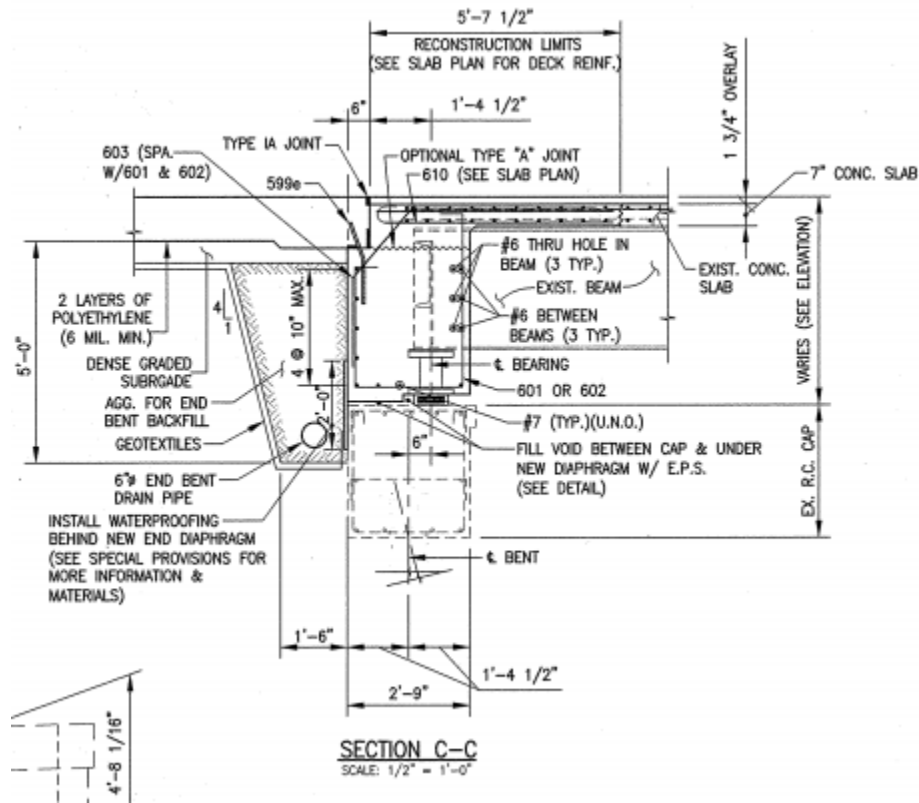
Abutment Detail of the Bridge (NBI 14840) (2004)
